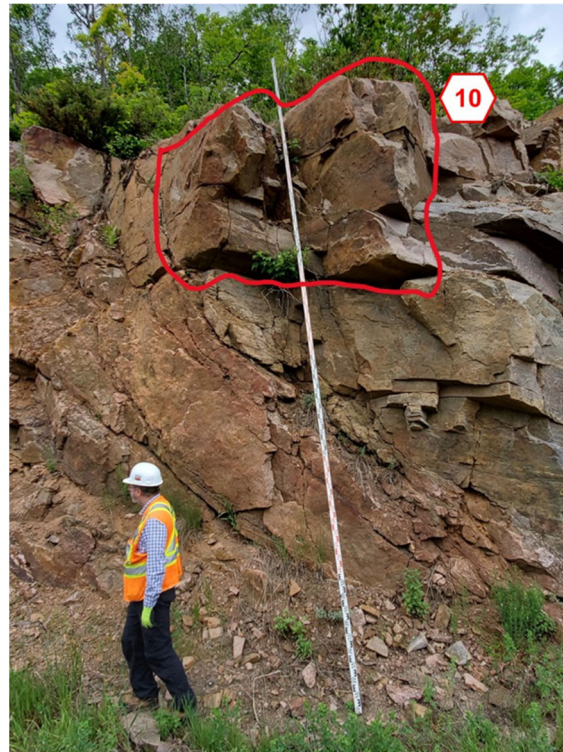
Existing Rock Cut Site E-17-1, near 12+680 Left (2020/06/09)
